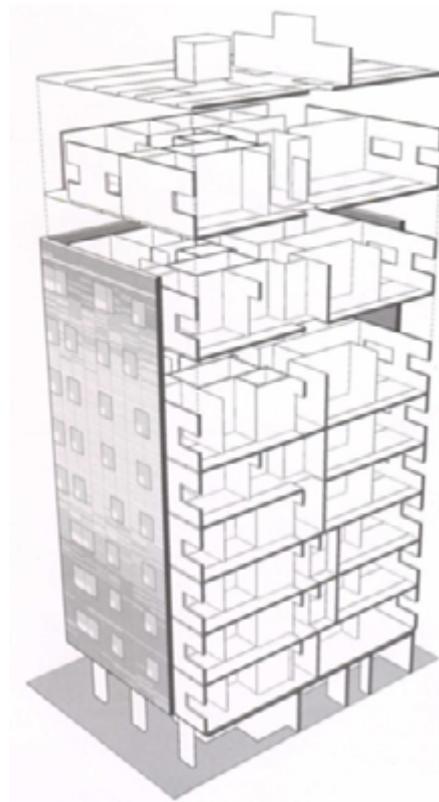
Isometric of Stadthaus Building, London, showing the close spaced CLT walls
